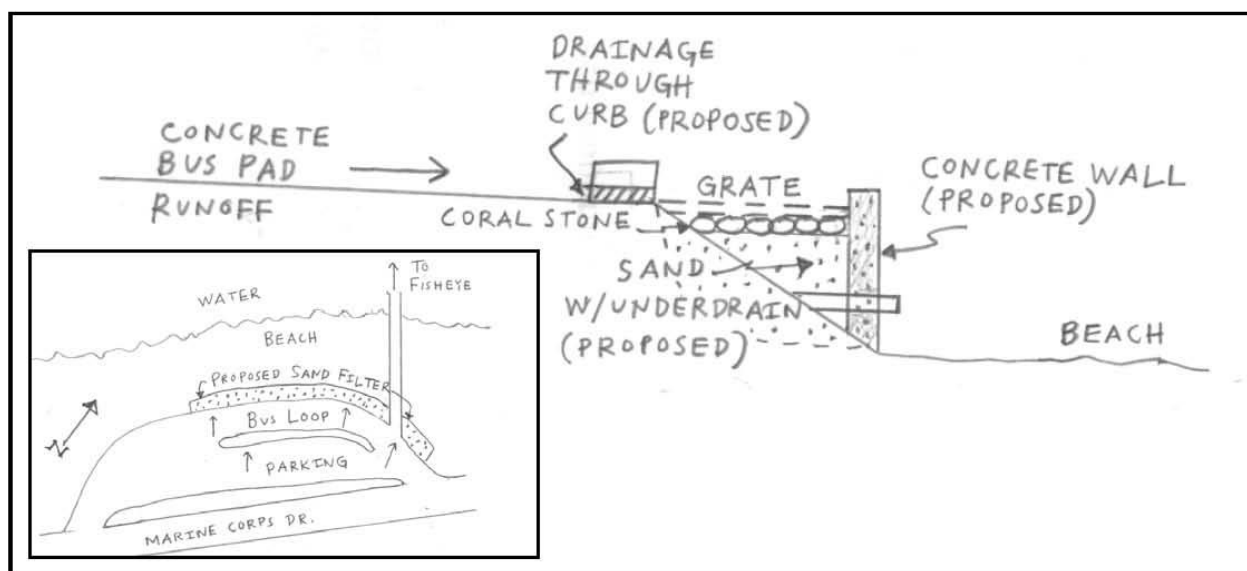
Plan view (inset) and cross-section view of proposed sand filter adjacent to bus loop (conceptual – not to scale).
